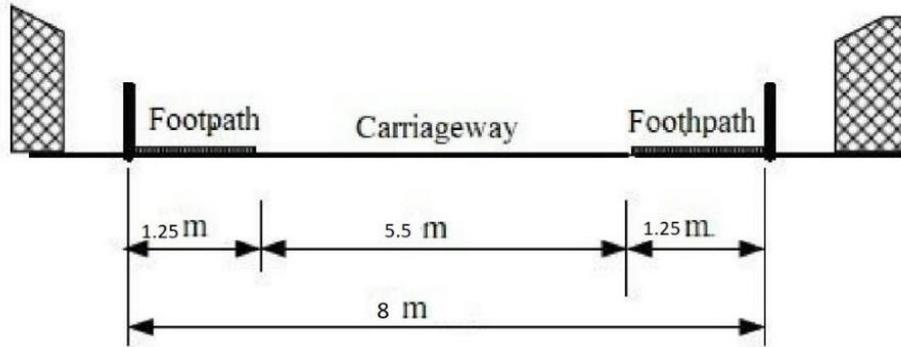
Typical Cross-section for Class C Roads (with RoW 8 m)
